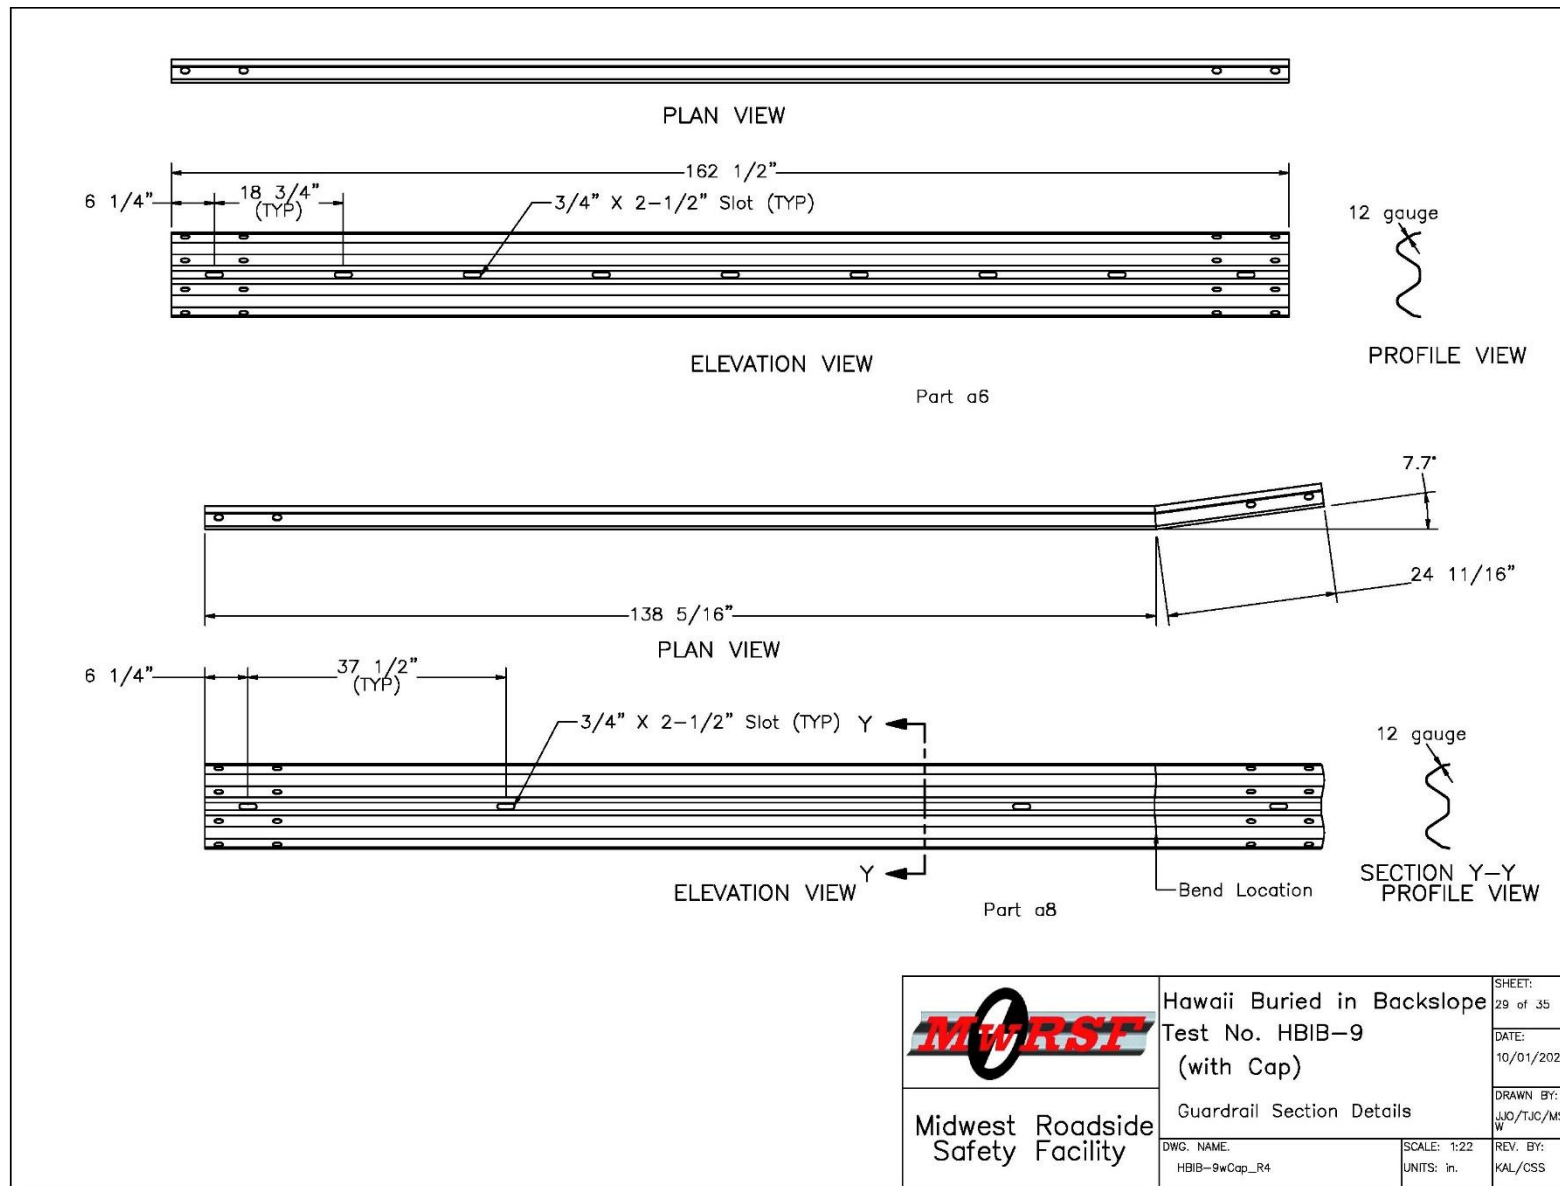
Guardrail Section Details, Cont., Test No. HBIB-9
